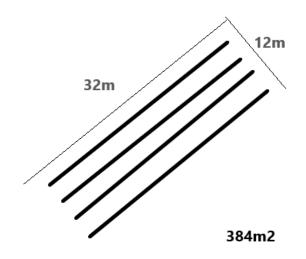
General trench layout and application area with 2m trench separation (384m²).
